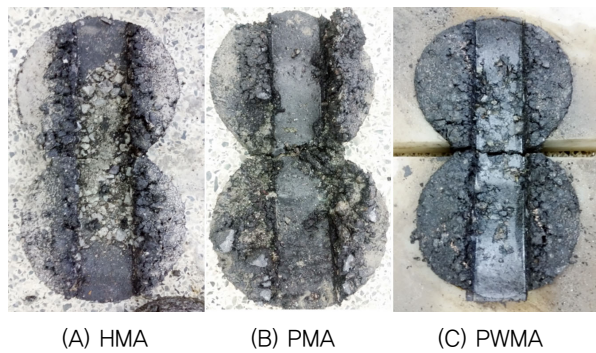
Specimen After Hamburg Wheel Tracking Test
